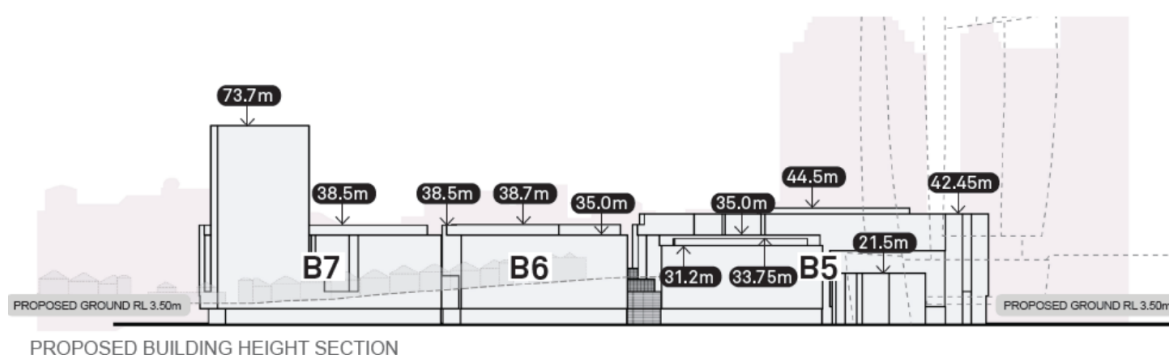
PROPOSED BUILDING HEIGHTS AND MASSING OF THE CENTRAL BARANGAROO BLOCKS
